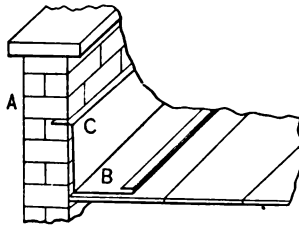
Side Strip Inserted to Connect Roof with Wall.
